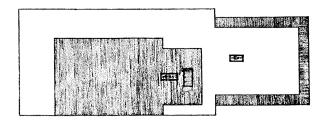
Reconstruction of the two consecutive churches presented by Kronqvist. The choir of the first wooden church was 3 metres narrower than the nave. The altar in the reconstruction was fairly large, over 2 metres wide. Plan: Iikka Kronqvist 1948, 11.
